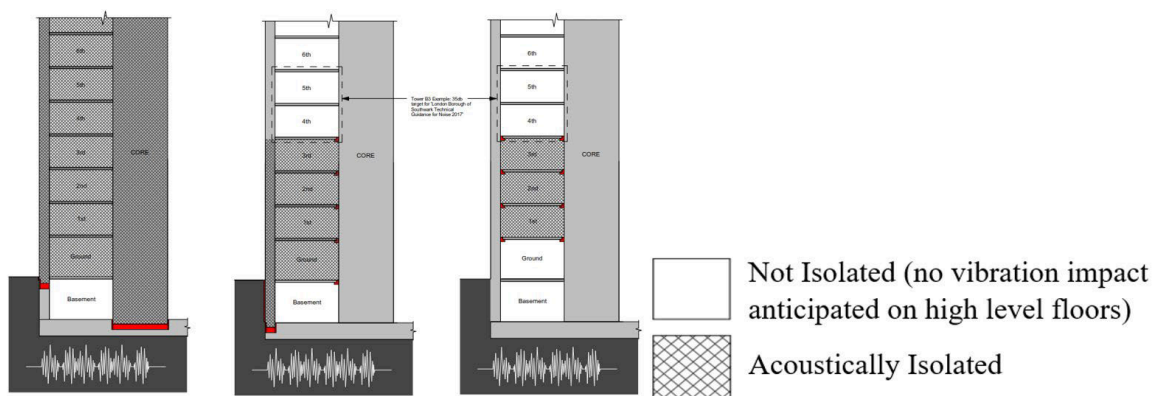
Scenarios considered in a design study to establish the optimal design to protect the first 4-6 floors of a circa 30 storey tower from ground-borne noise generated by underground rail or a basement nightclub. Left, 6a: Full building isolation, Middle, 6b: isolation of columns at ground level and the first 4-6 floor slabs from the core, Right, 6c: isolation of the first 4-6 floors from the unisolated columns and core.
